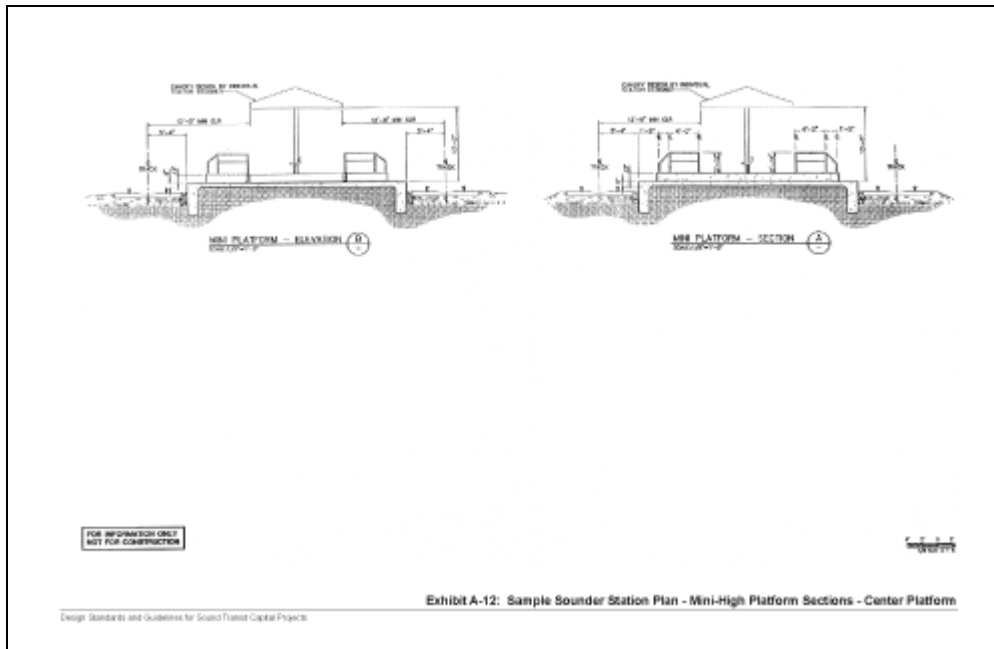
Sample Sounder Station Plans – Mini-High Platform Sections – Center Platform (649 KB)
